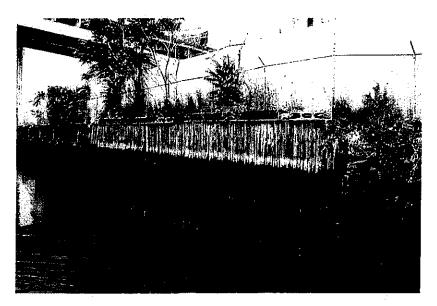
STA 1+03 TO 1+70 RELLEVING PLATFORM FACE
